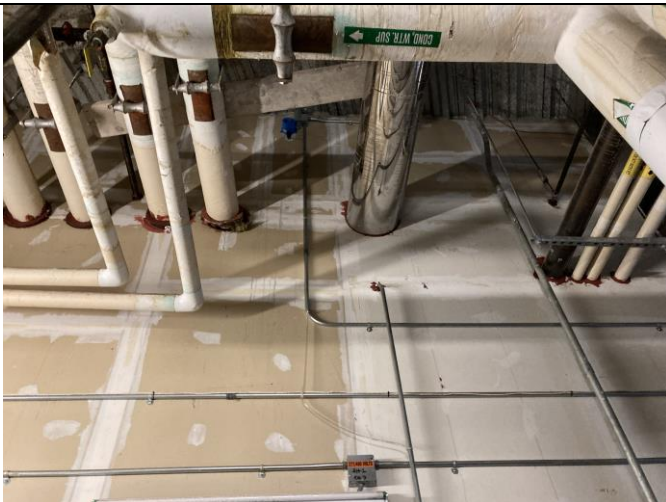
Inspection of gas survey sensor in Boiler Room of Ballpark.
